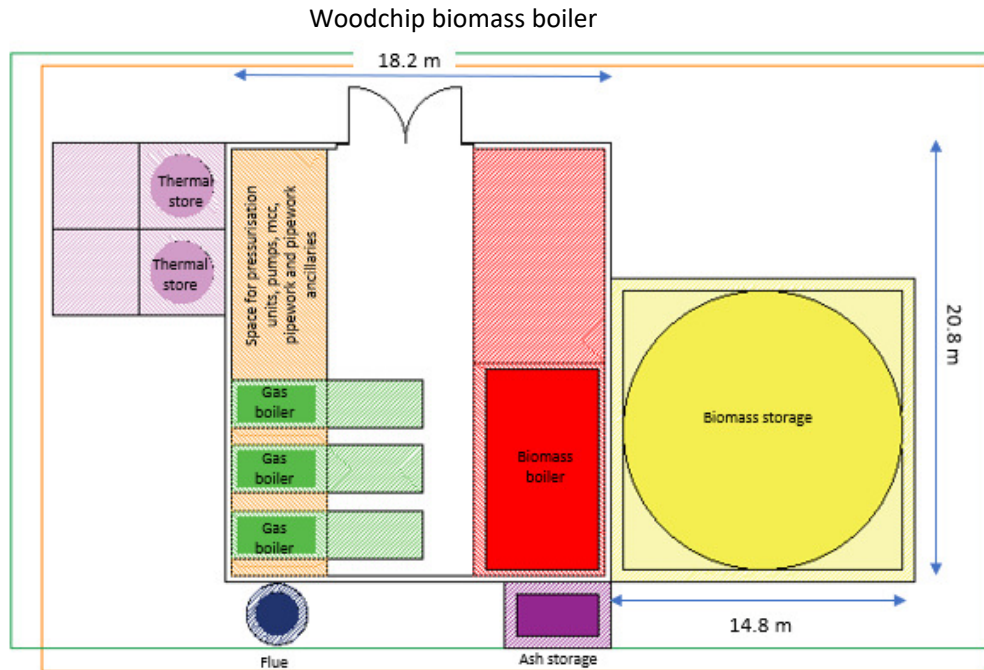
Woodchip biomass in ECA – water tank area (orange) and ECB – ex-laundry site (green)
